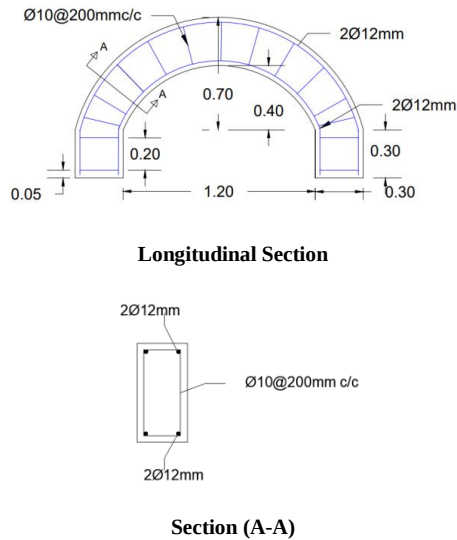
Reinforced concrete arches dimensions and steel reinforcement details. (Dimensions of the drawing are in meters)
